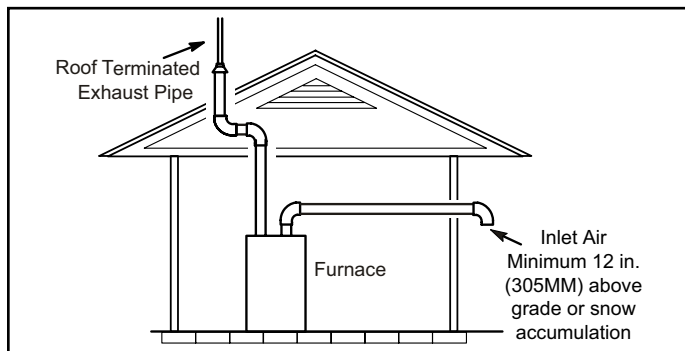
Exiting Exhaust and Intake Vent (no common pressure zone)
